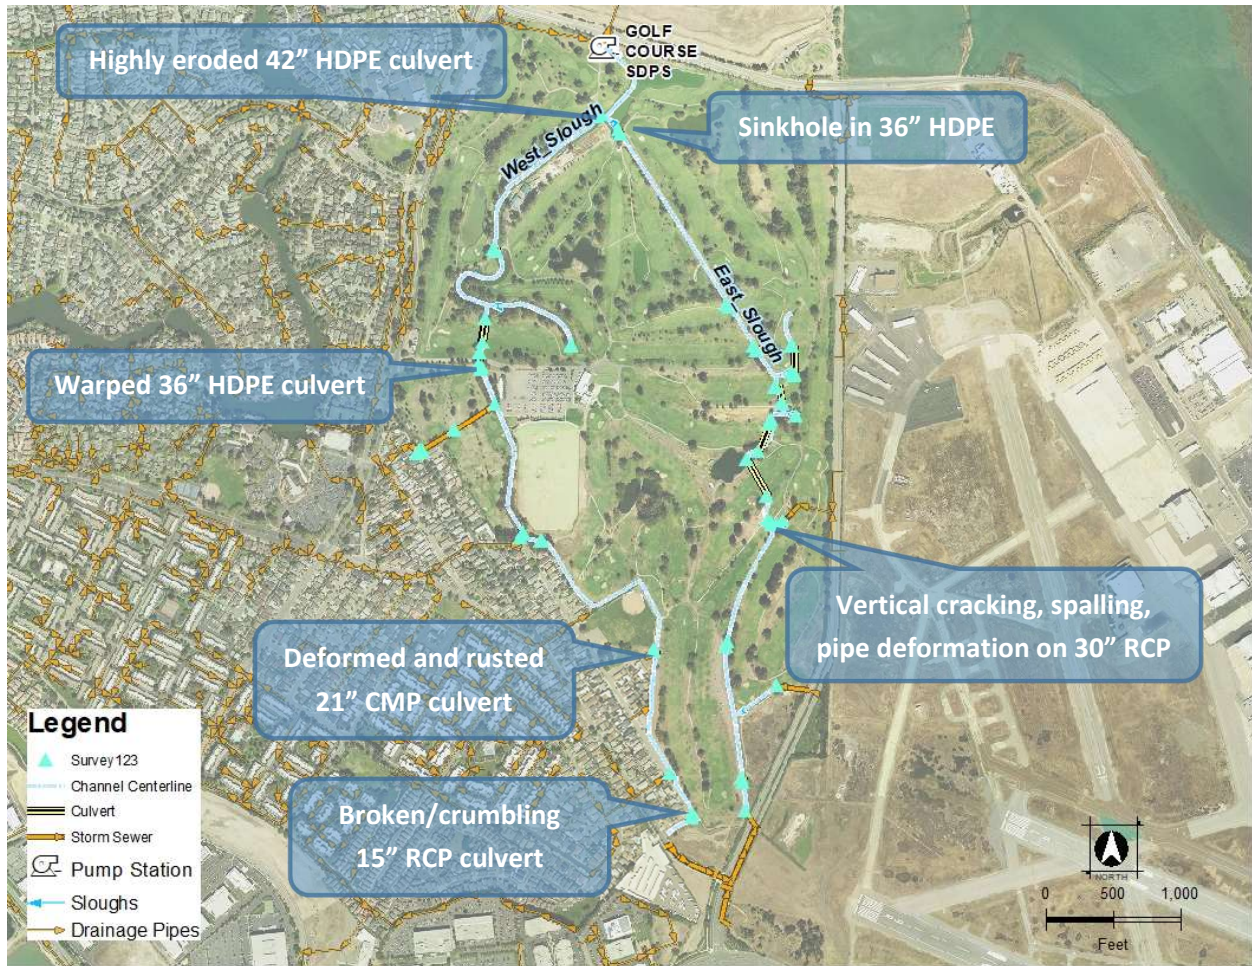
Survey123 Structural Assessment Locations (Poor Condition Rating Called Out)
